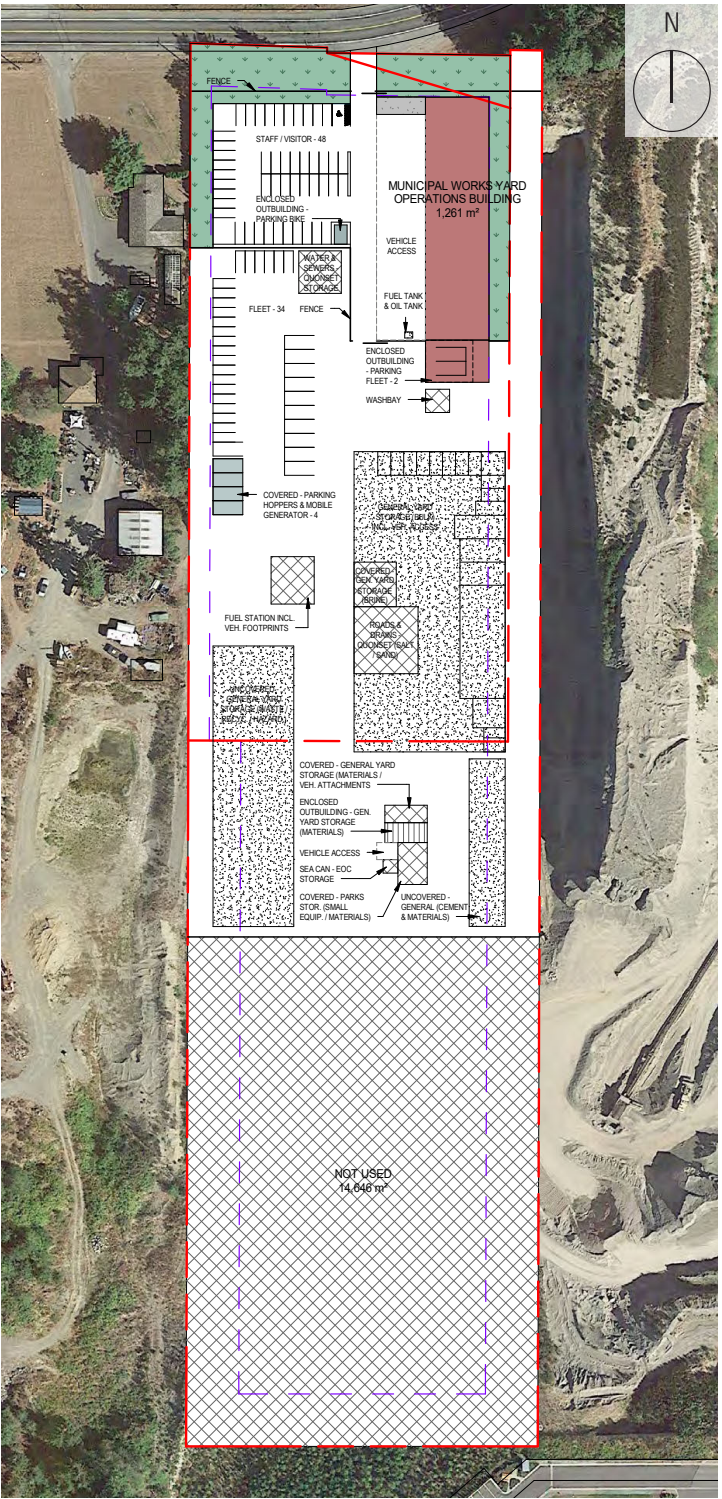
1703 Keating Cross Road Site Concept: Site Distribution Concept 1
